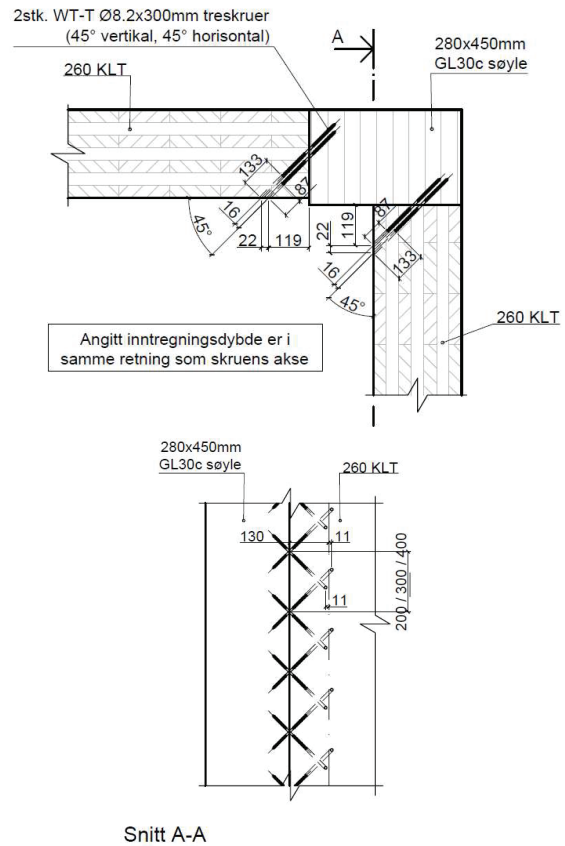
Timber screws at CLT shear wall to glulam column connection wall interface
